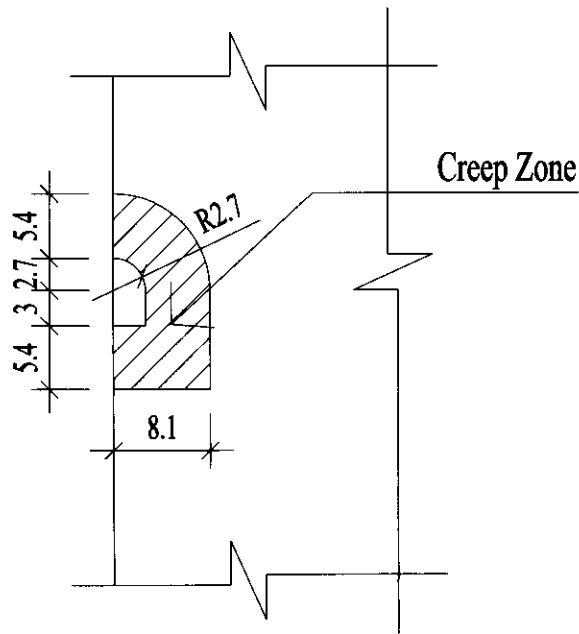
Creep Zone of MMH tunnel (unit: m).
